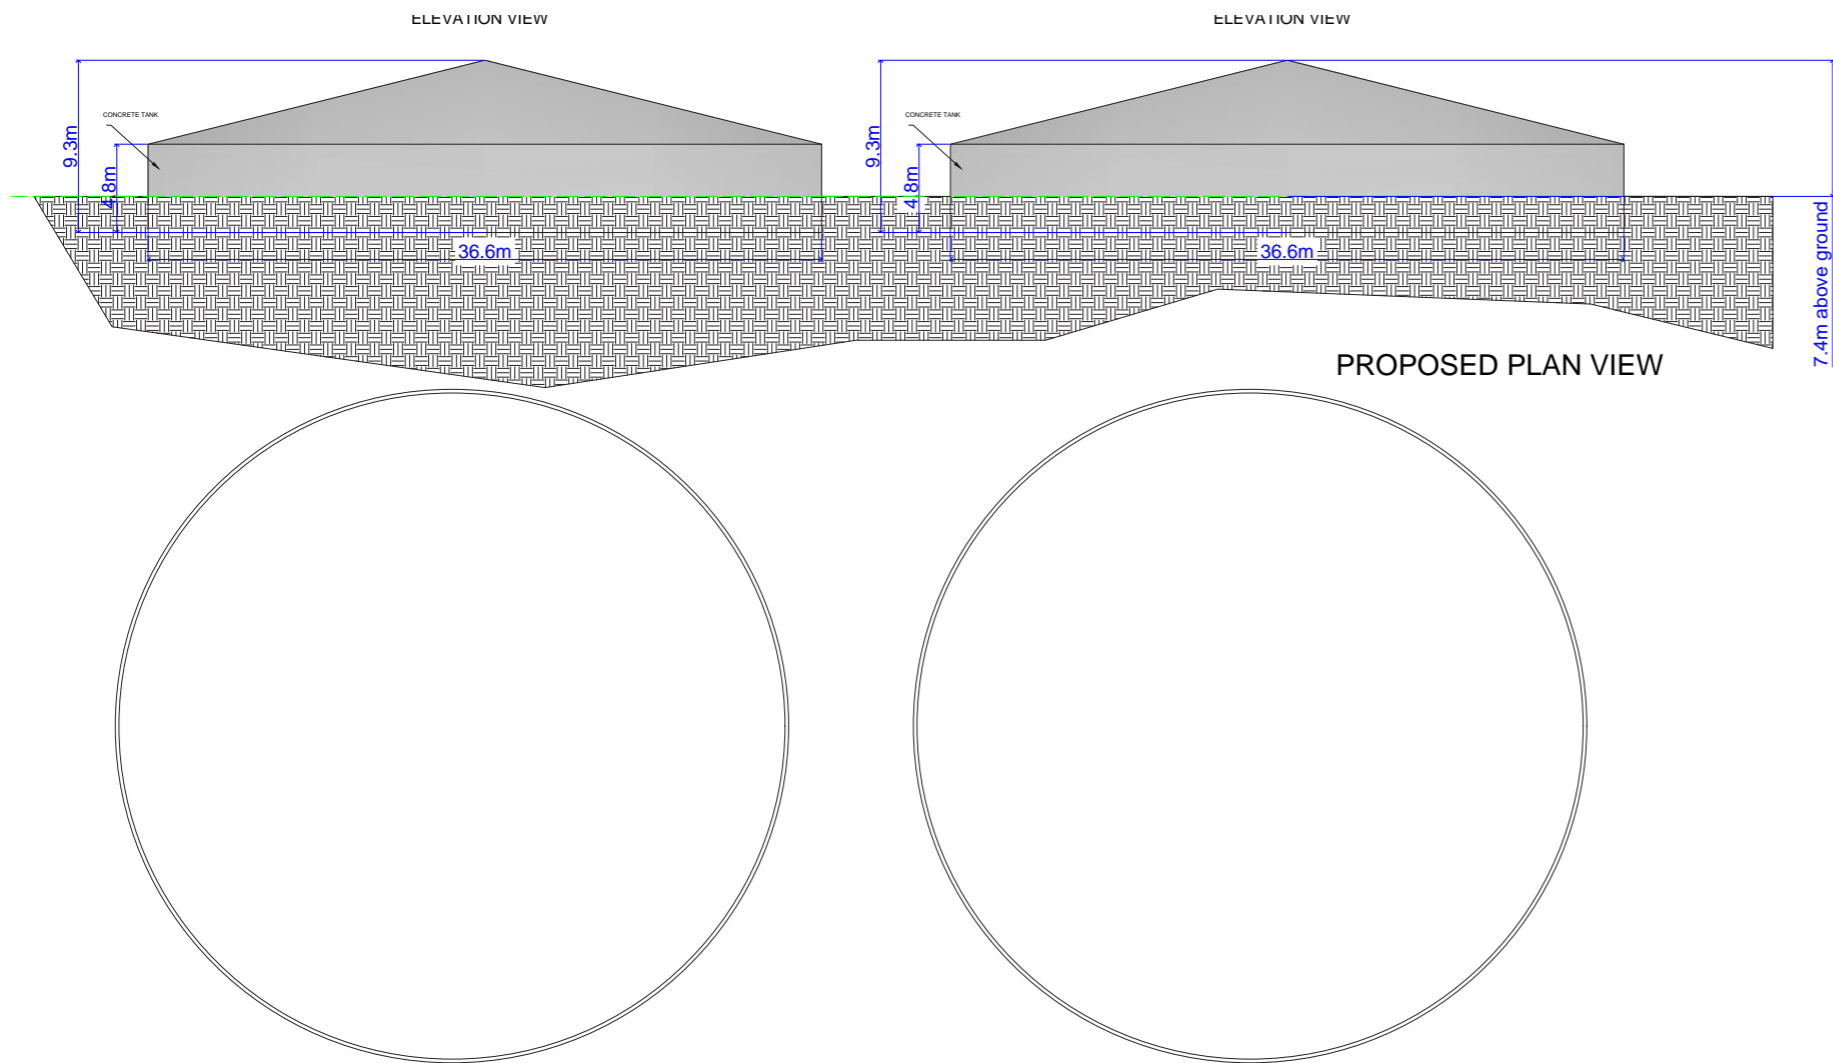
Proposed Site Plan and Elevations for Slurry Storage Tanks
